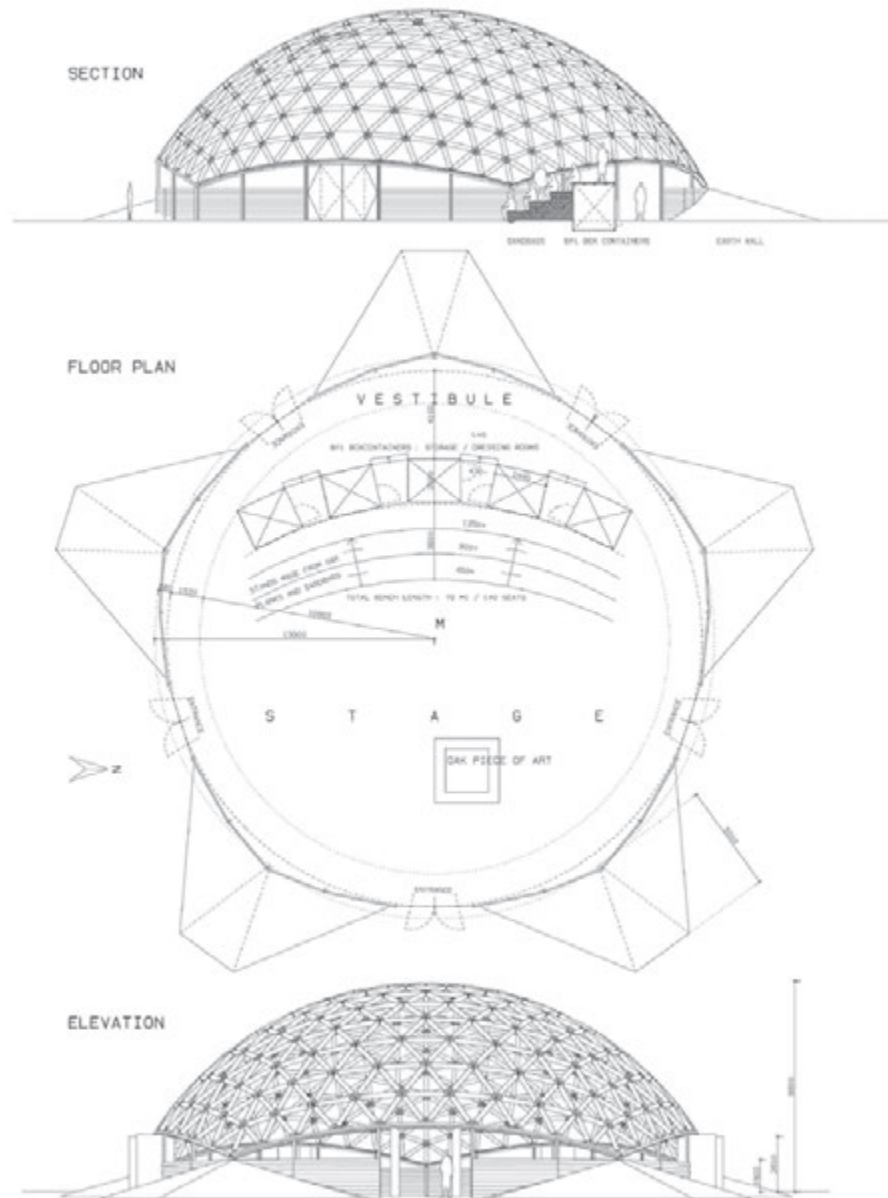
Paper Dome Theatre – section, floor plan and elevation, 2003
